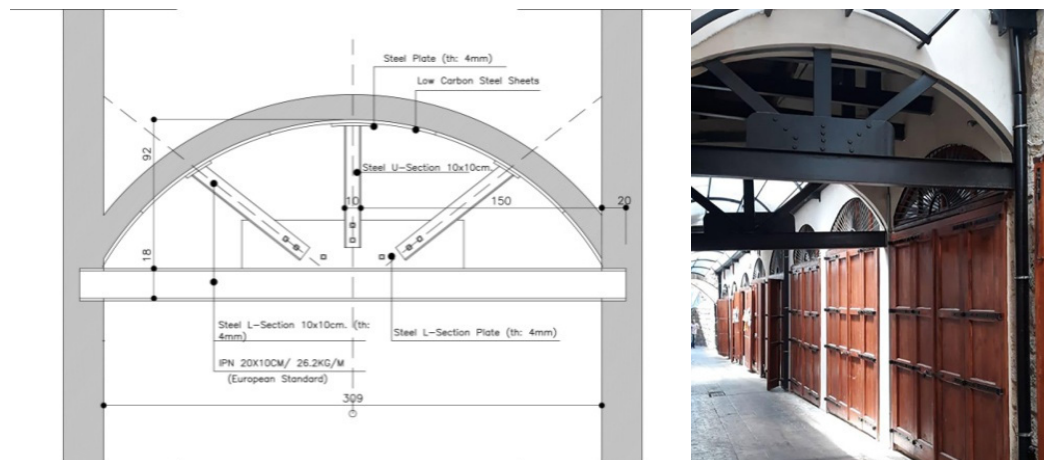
Flanges of I-beams connected by bolting in the form of segmental arches (Hammoud J., 2021)
